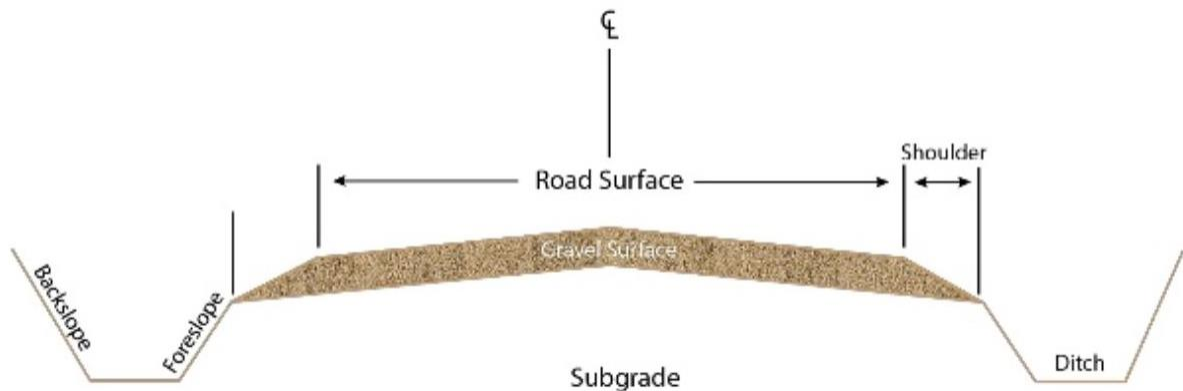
Typical Cross Section of Gravel Roads (Skorseth & Selim, 2005)
